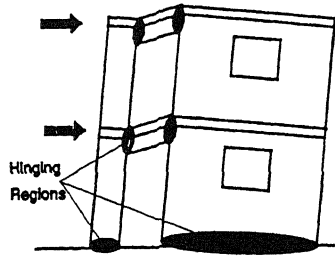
Coupled wall-type collapse mechanism of Specimen 1b
